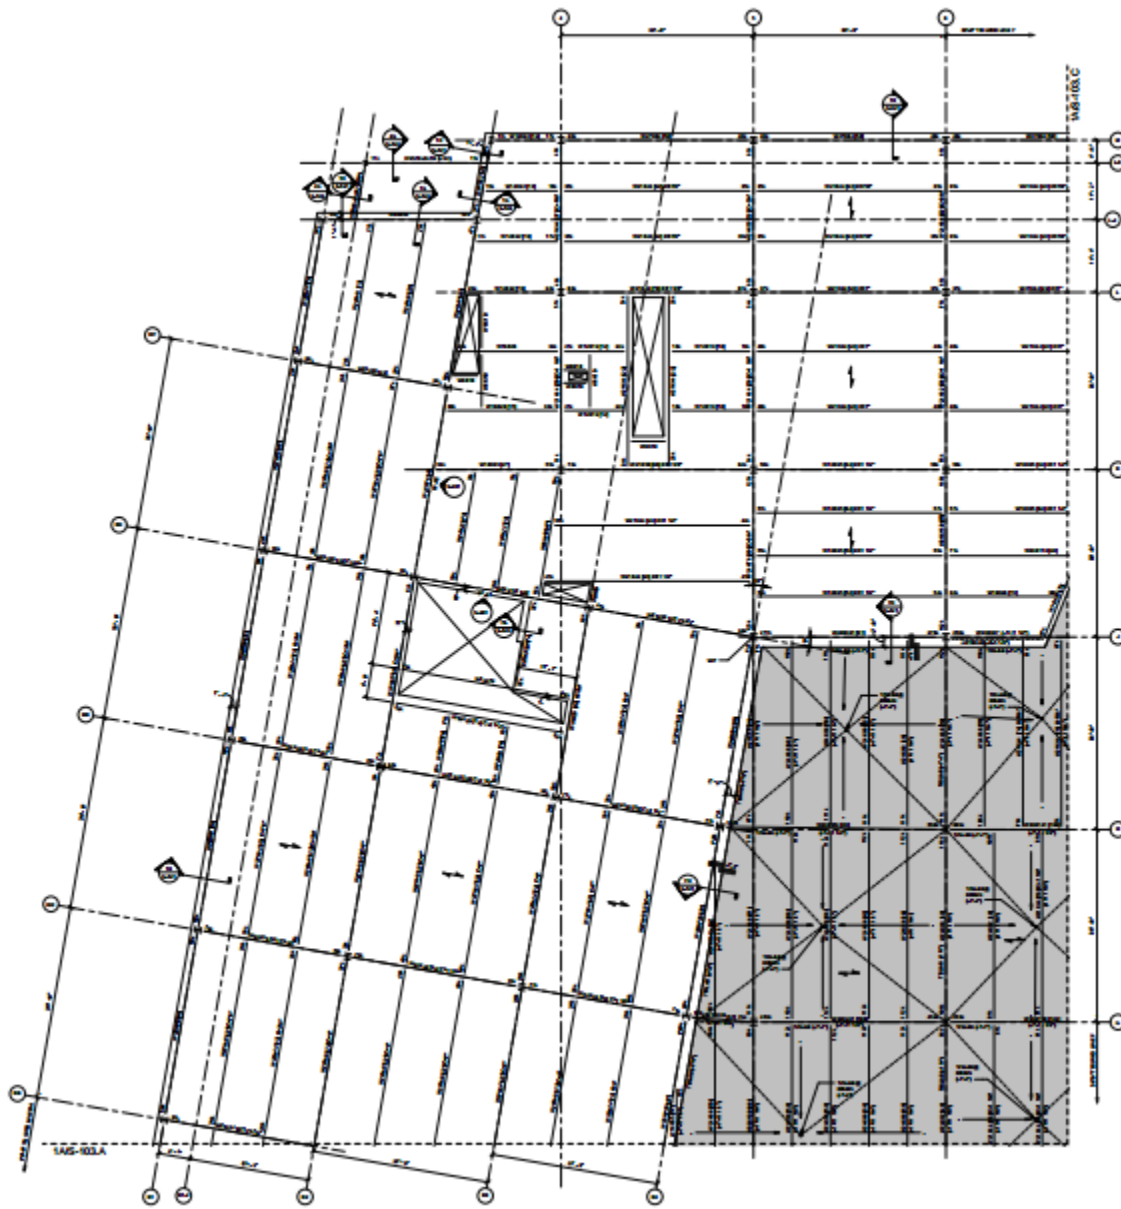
TYPICAL SEGMENT B FLOOR FRAMING PLAN
